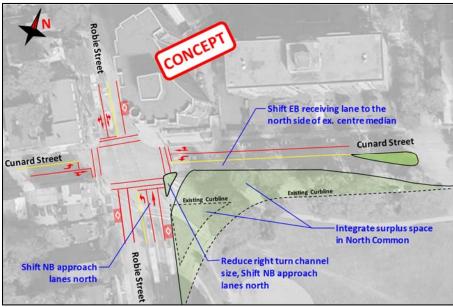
Proposed Intersection Configuration - Robie Street @ Cunard Street
